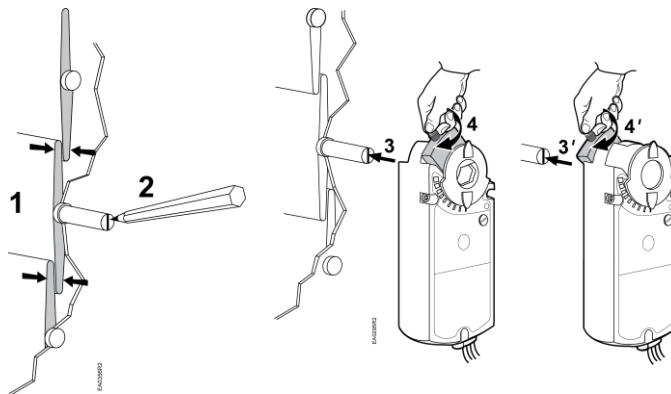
Mount the Actuator to the Damper Shaft. Go to Figure 9 to Complete the Mounting.
